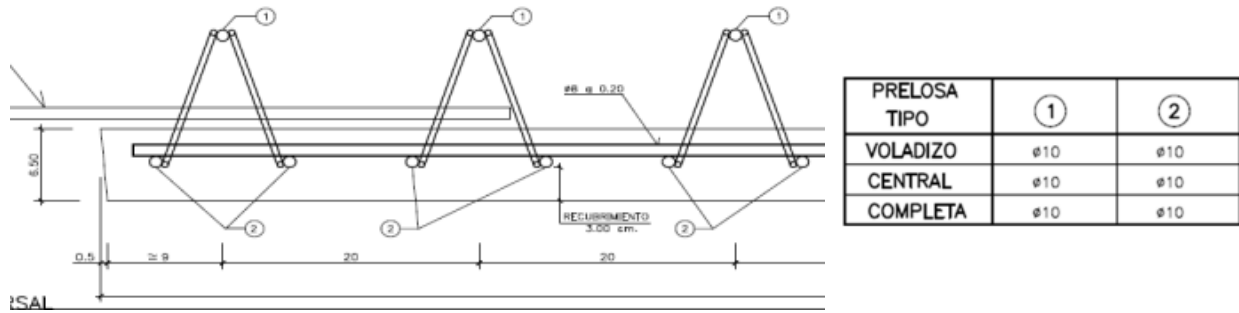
Lattice girder spacing detail (courtesy of Bridges and Roads, LLC.)
